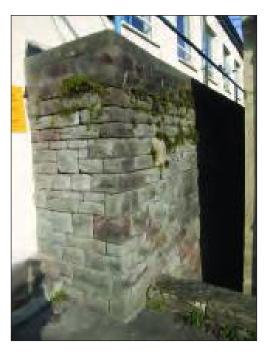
Retaining wall on the south-east face of t he recreation block, looking north
